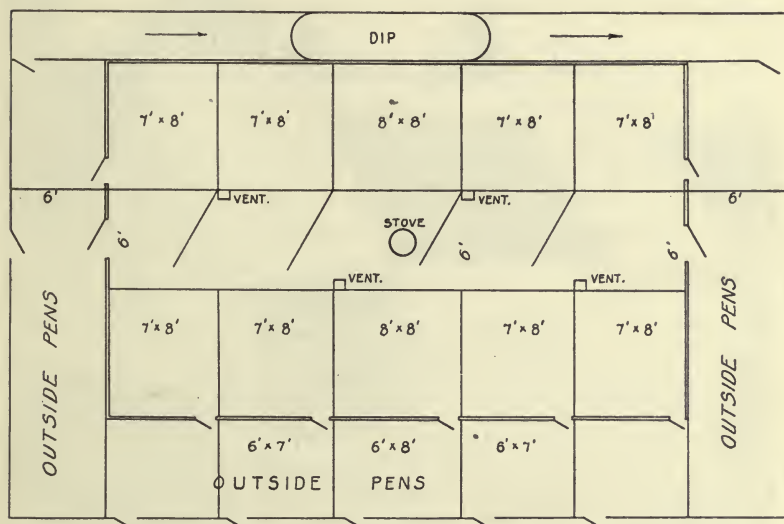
GROUND PLAN OF HOUSE IN FIGURE 1.
